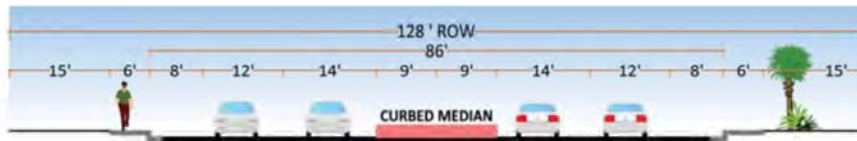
CITY OF JURUPA VALLEY GENERAL PLAN ROADWAY CROSS-SECTIONS
